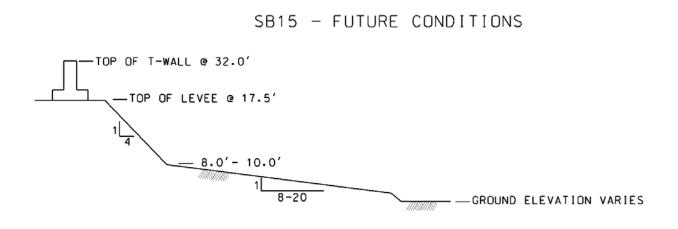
Typical Levee Design Cross-section MRGO Levee/Floodwall Combination (SB15)
